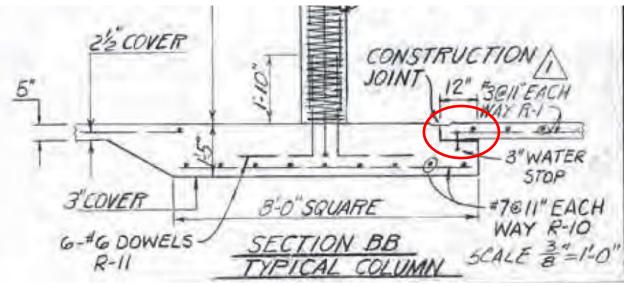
Unreinforced Expansion Joint, Drawing 10-S-10 from 1971 Drawings
